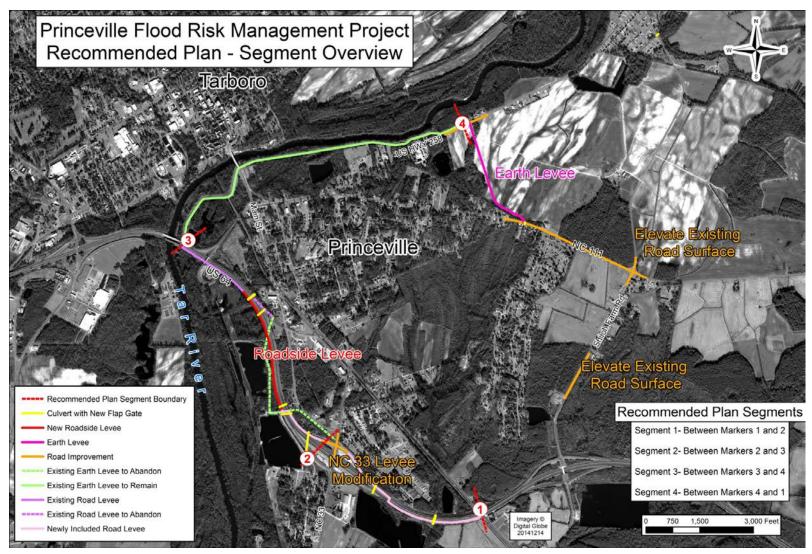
Levee Extension Layout for Selected Plan
